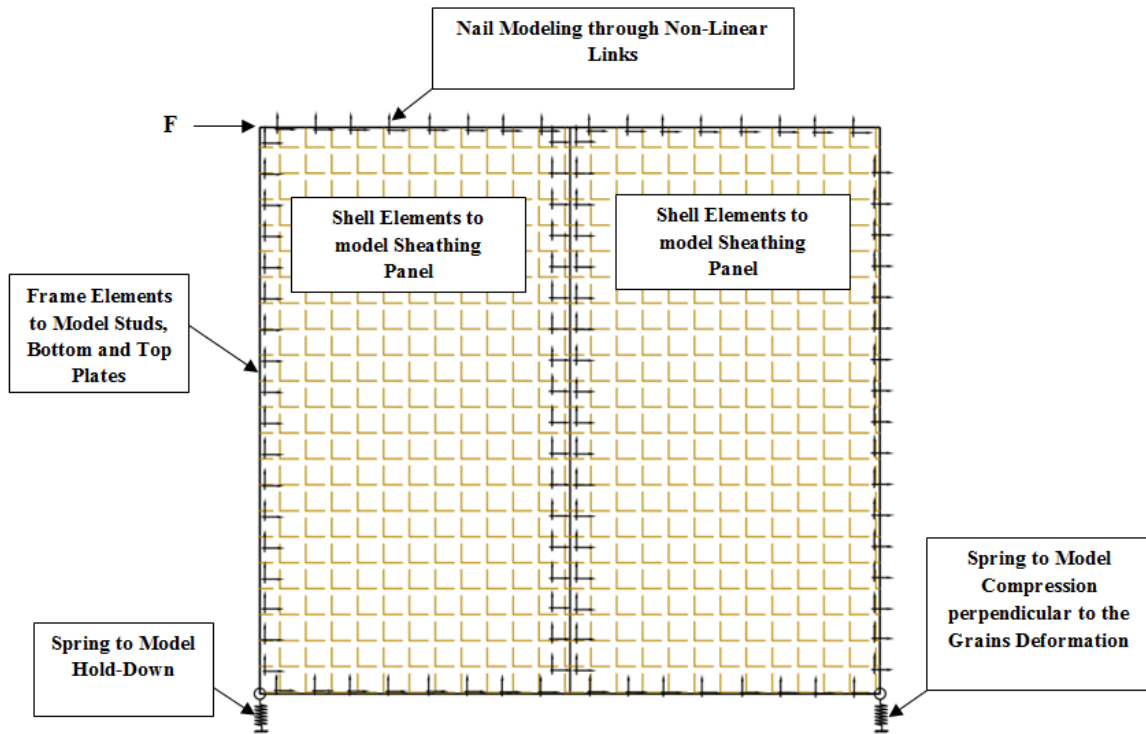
Detailed Full-Scale Shear wall Model (SAP 2000)
